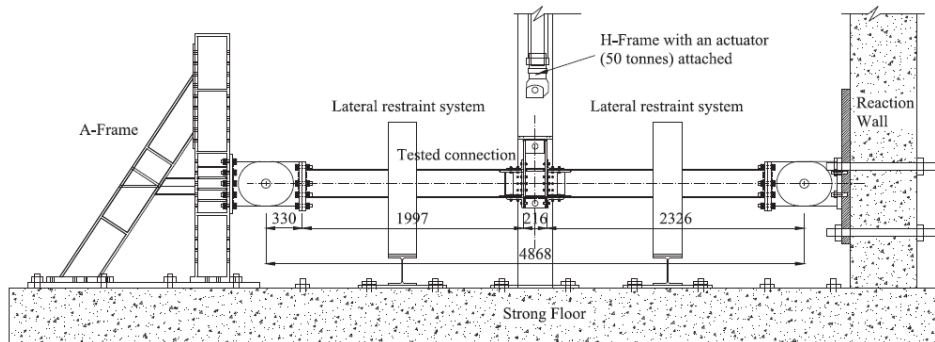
Prototype beam-column joint and elevation view of the test set-up (Yang and Tan, 2012)
